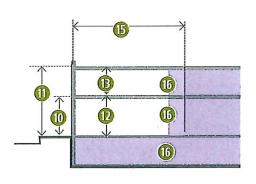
B. Workshop/Warehouse: Building Siting
